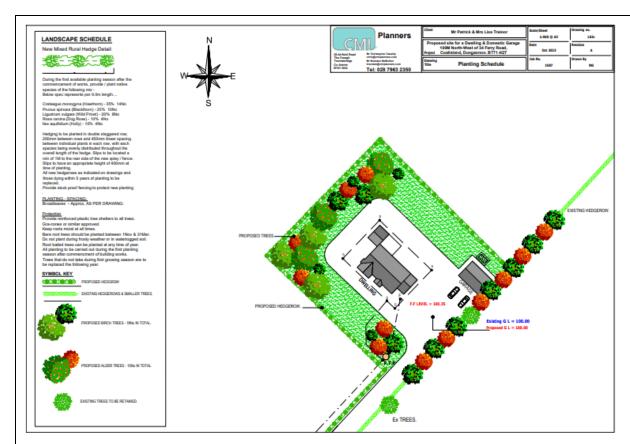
Block plan of dwelling and garage currently proposed, including revised landscaping plan
